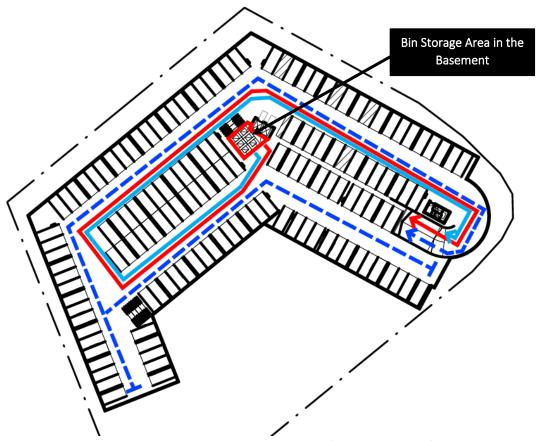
Basement Level Plan indicating the Waste Storage Area (Source: Archidiom)
